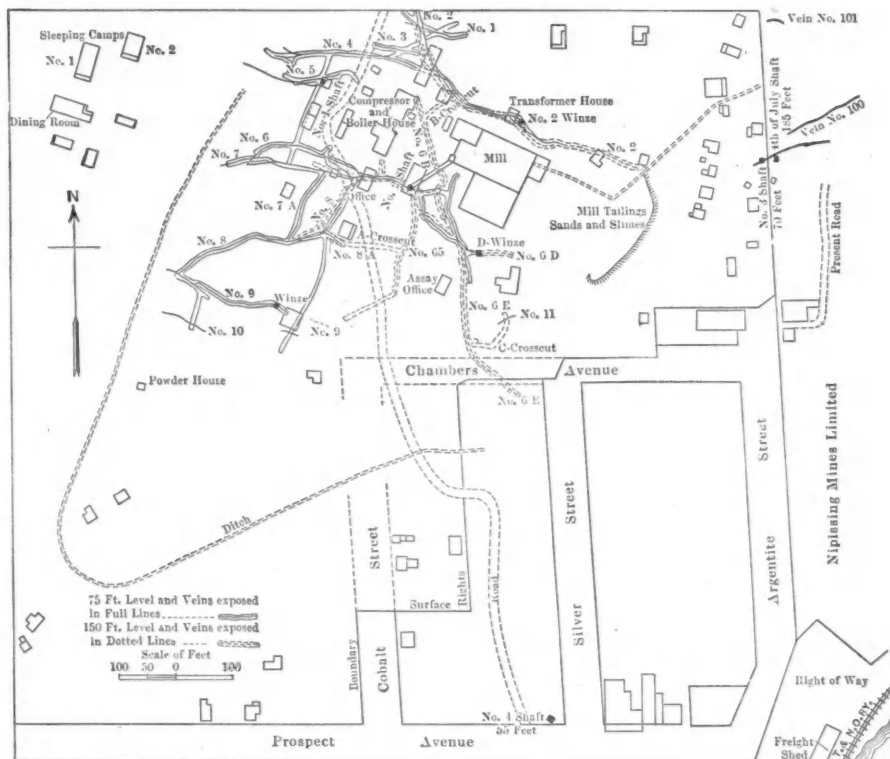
PLAN SHOWING BUILDINGS AND UNDERGROUND WORKINGS OF THE CONIAGAS MINES, LTD.
